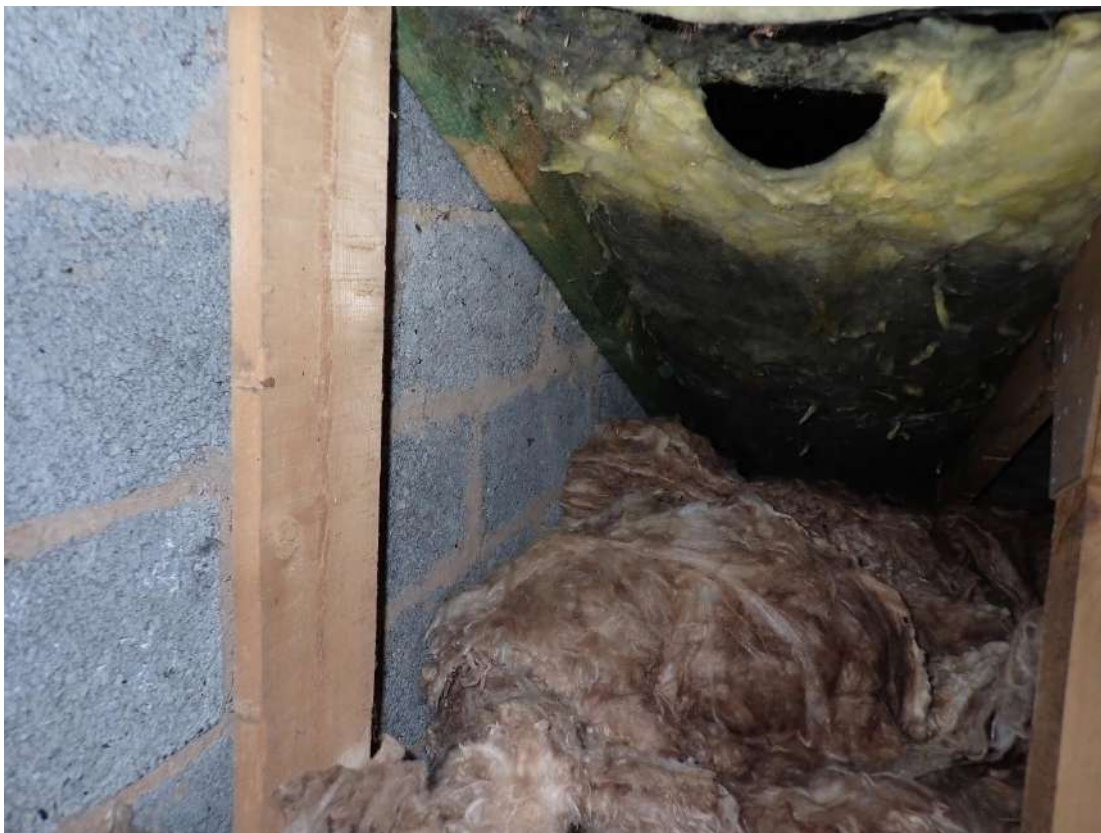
View of the side wall of Building 4 showing the large entrance points allowing access into the interior of the building.
